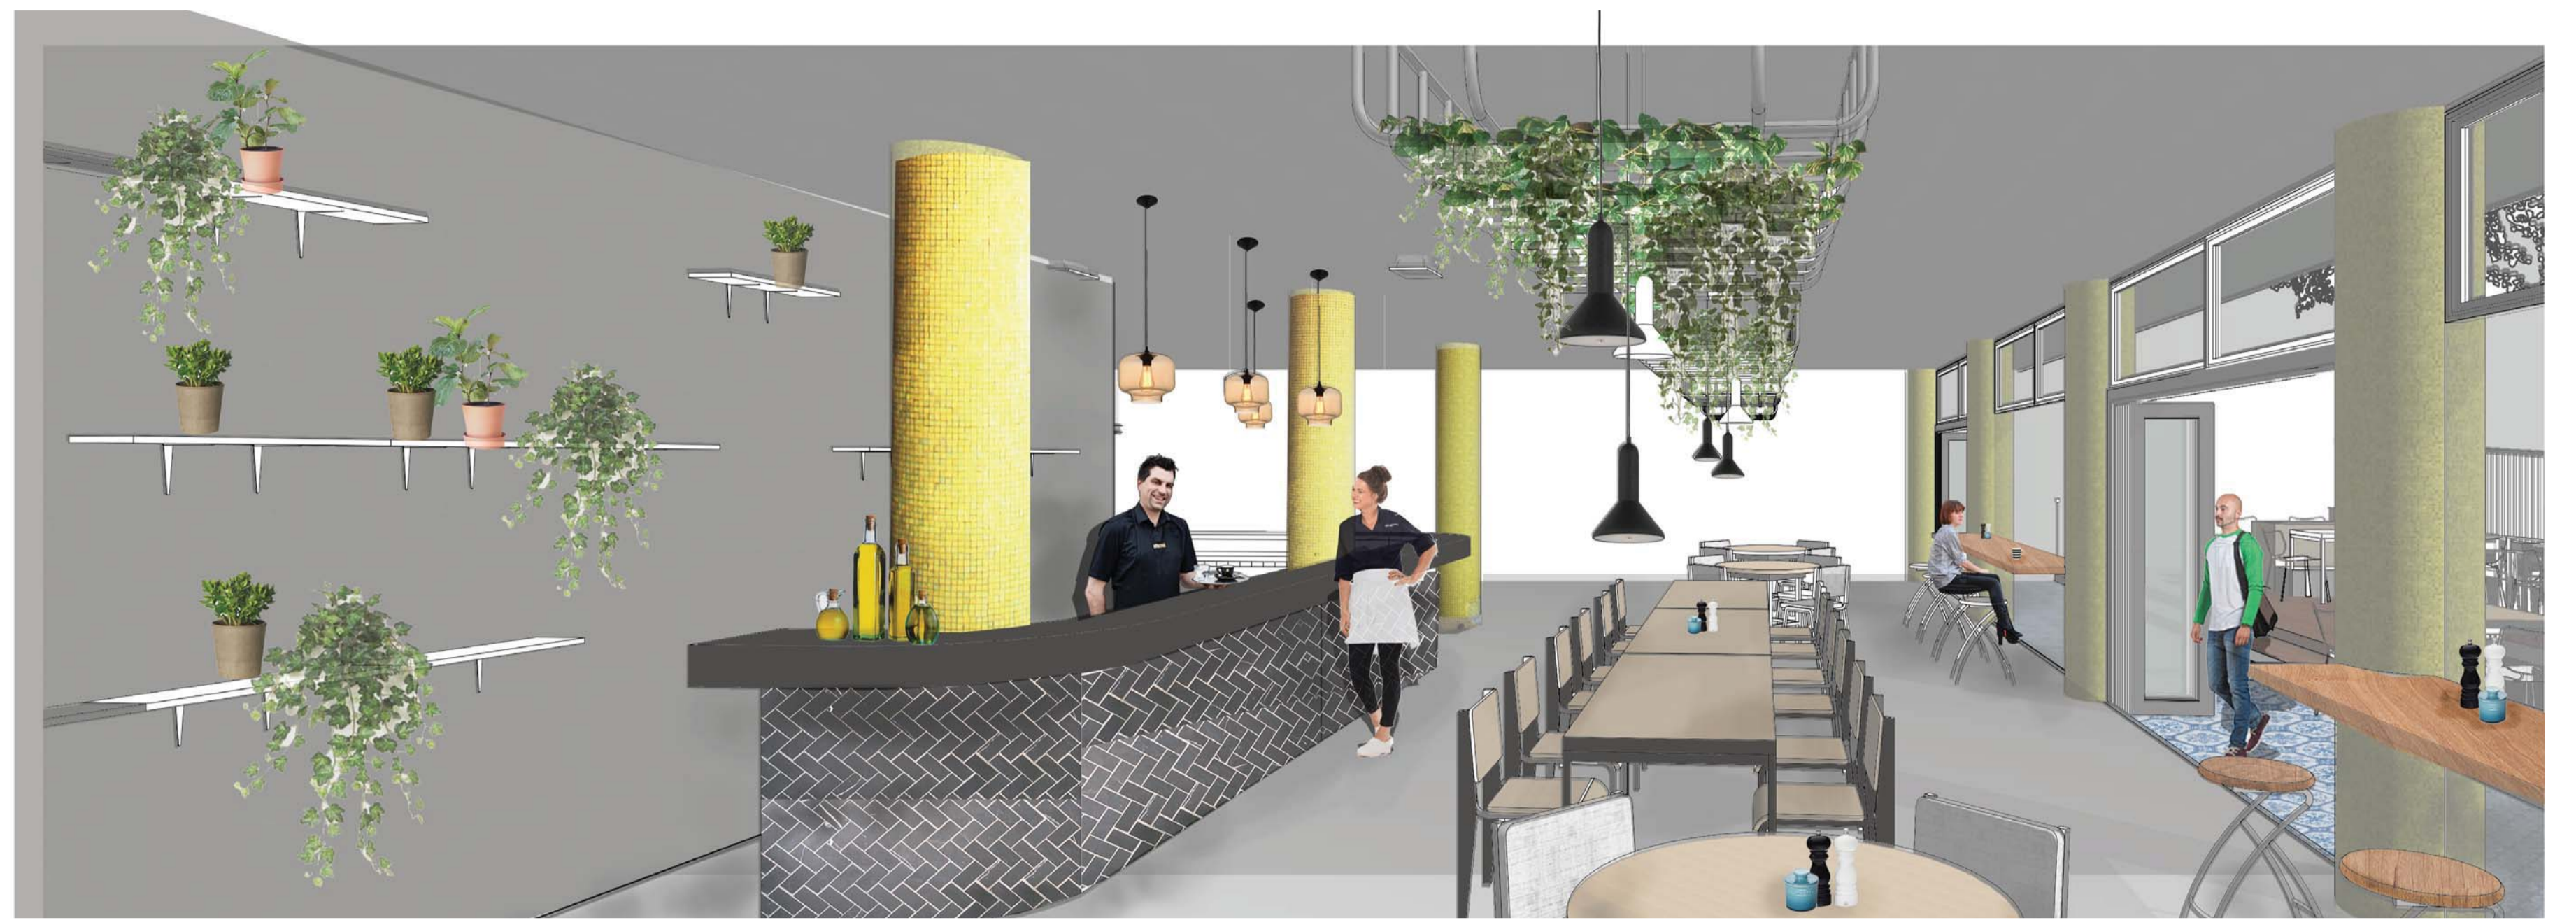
Canteen interior perspective: see view point 1 on plan.
